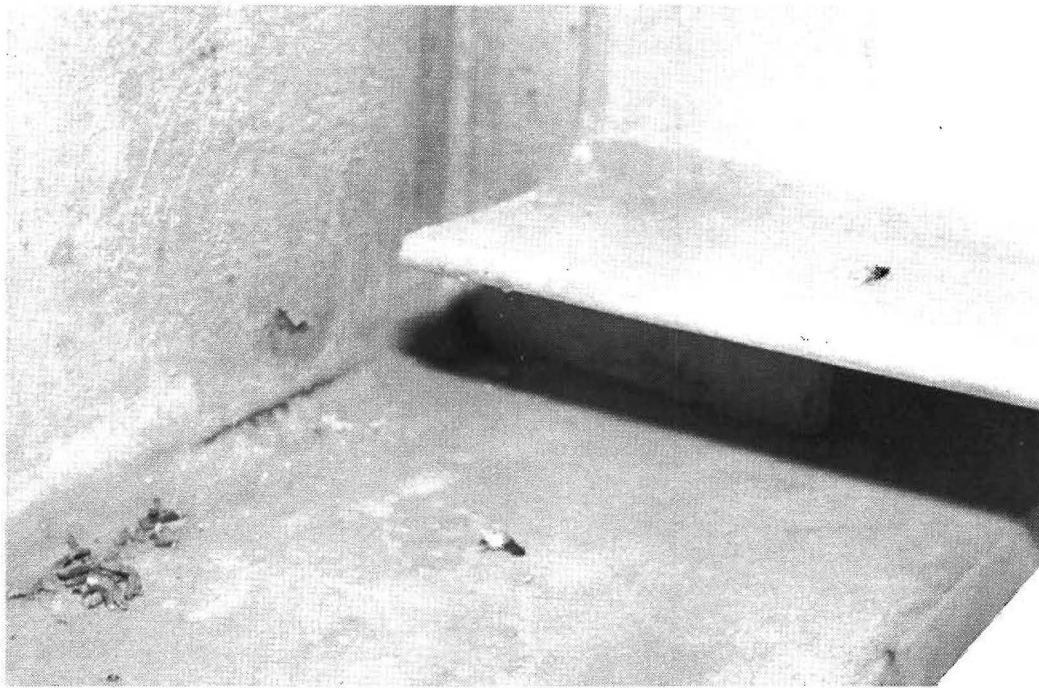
Crack in web-to-flange fillet weld.
